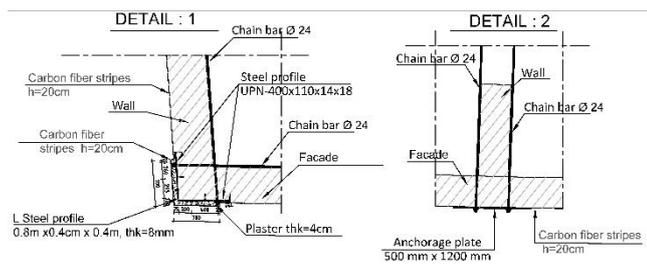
Details for the installation of the prestressed carbon fiber and the plates for the anchorage of the stainless chain bar.
